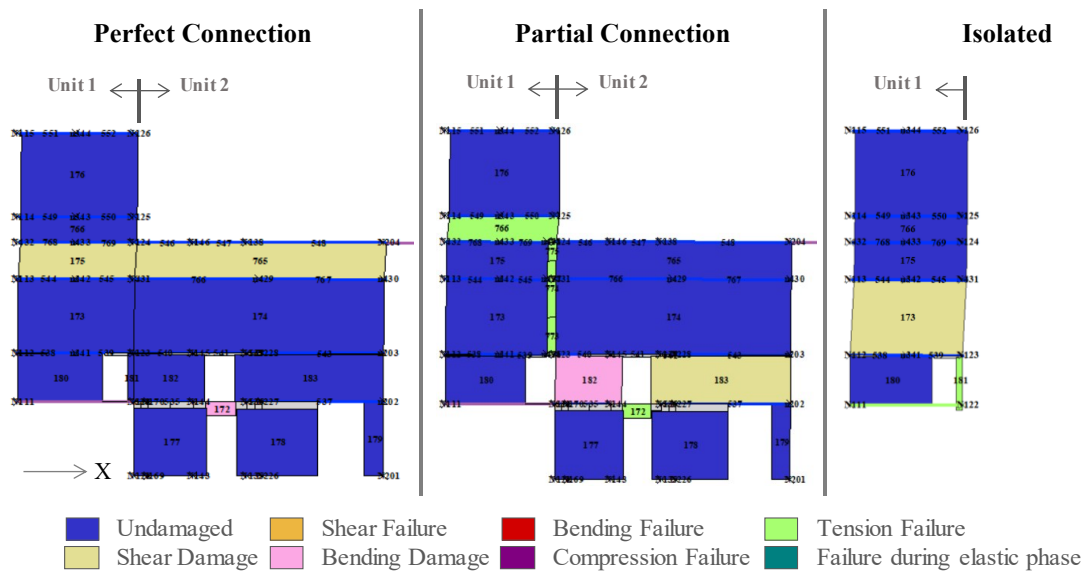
Damage pattern of a wall Px for a top-of-wall horizontal displacement of 0.01 m.
